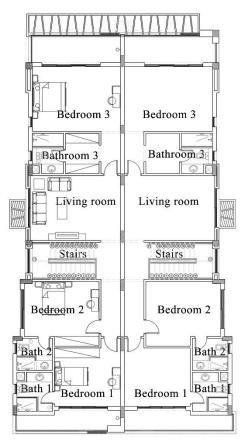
Standard standalone villa floor levels, window to floor area and window to floor area
